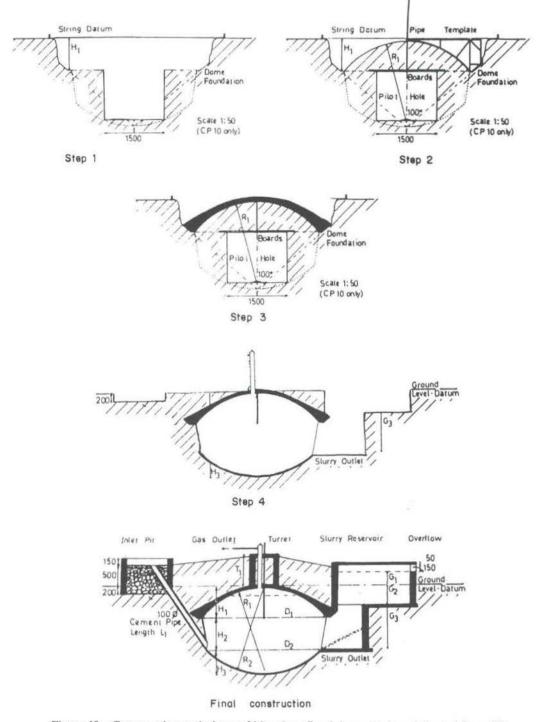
Construction technique of Nepalese fixed-dome design, (adapted from 19).
